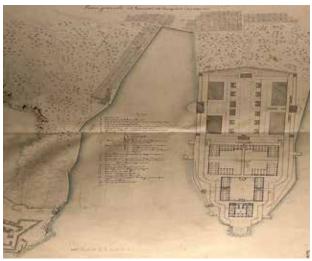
The Lazaretto of Varignano at La Spezia: Floor Plan Ippolito Cremona (1777–1844)
